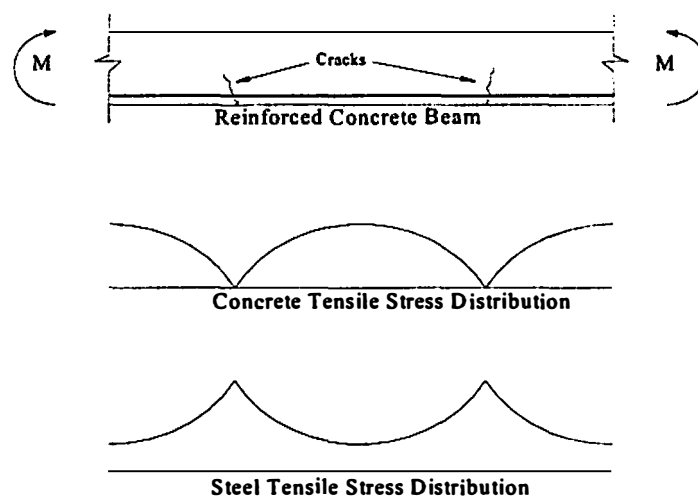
Strain in Concrete and Steel in Cracked Reinforced Concrete Member.
